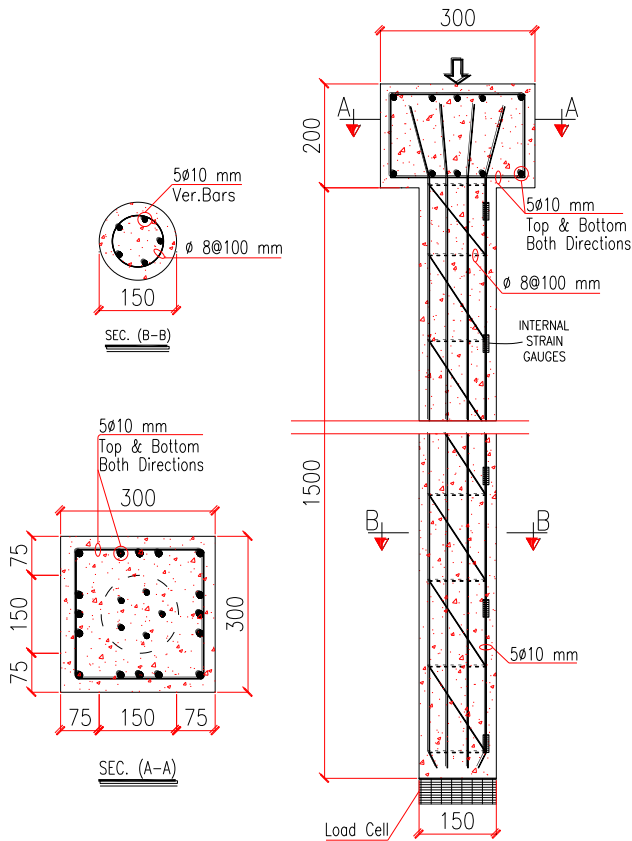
Concrete Dimension and Reinforcement for Group (1) – Single Pile
